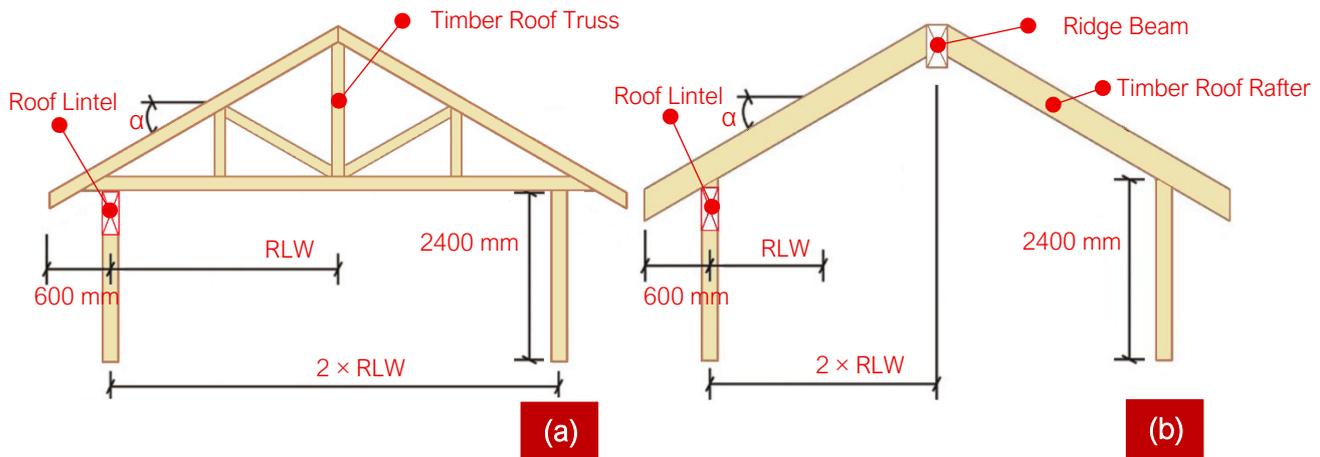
Red Stag Vertex₁₀ roof lintel beam; a) Timber roof truss, b) Timber roof rafter.
